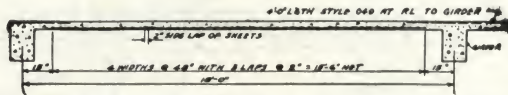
Detailing Widths of Mesh and Showing Extra Strip of Mesh Over the Girders
